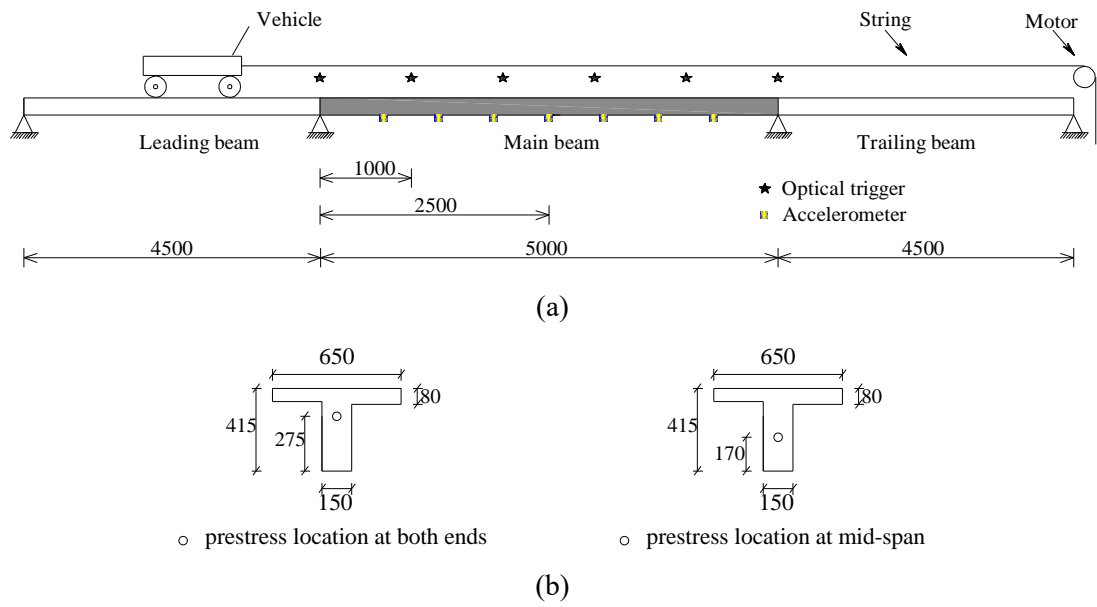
Schematic experimental setup: (a) plan view; (b) cross-sections. (unit: mm)
